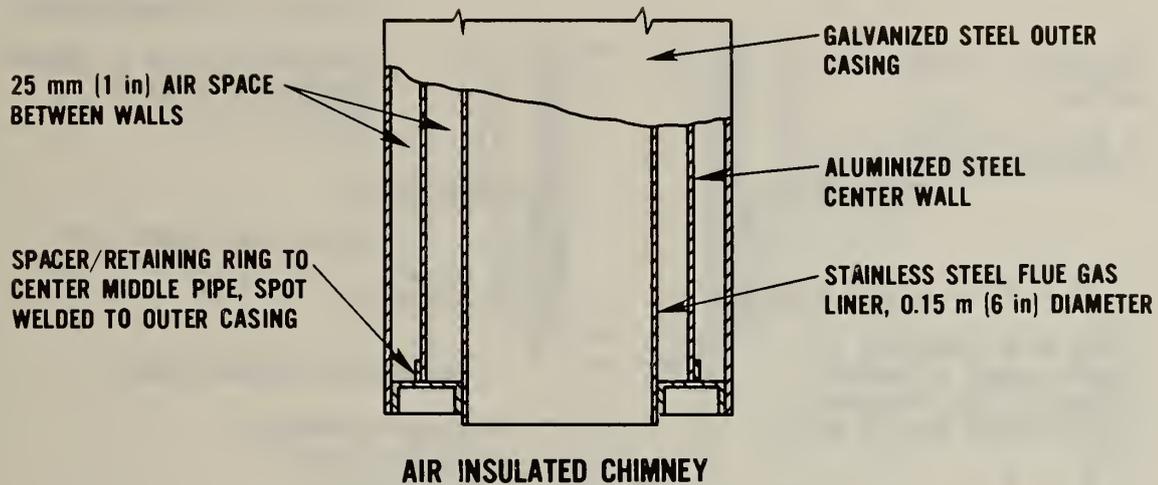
Details of the Construction of the Factory-Built Chimneys Tested.
